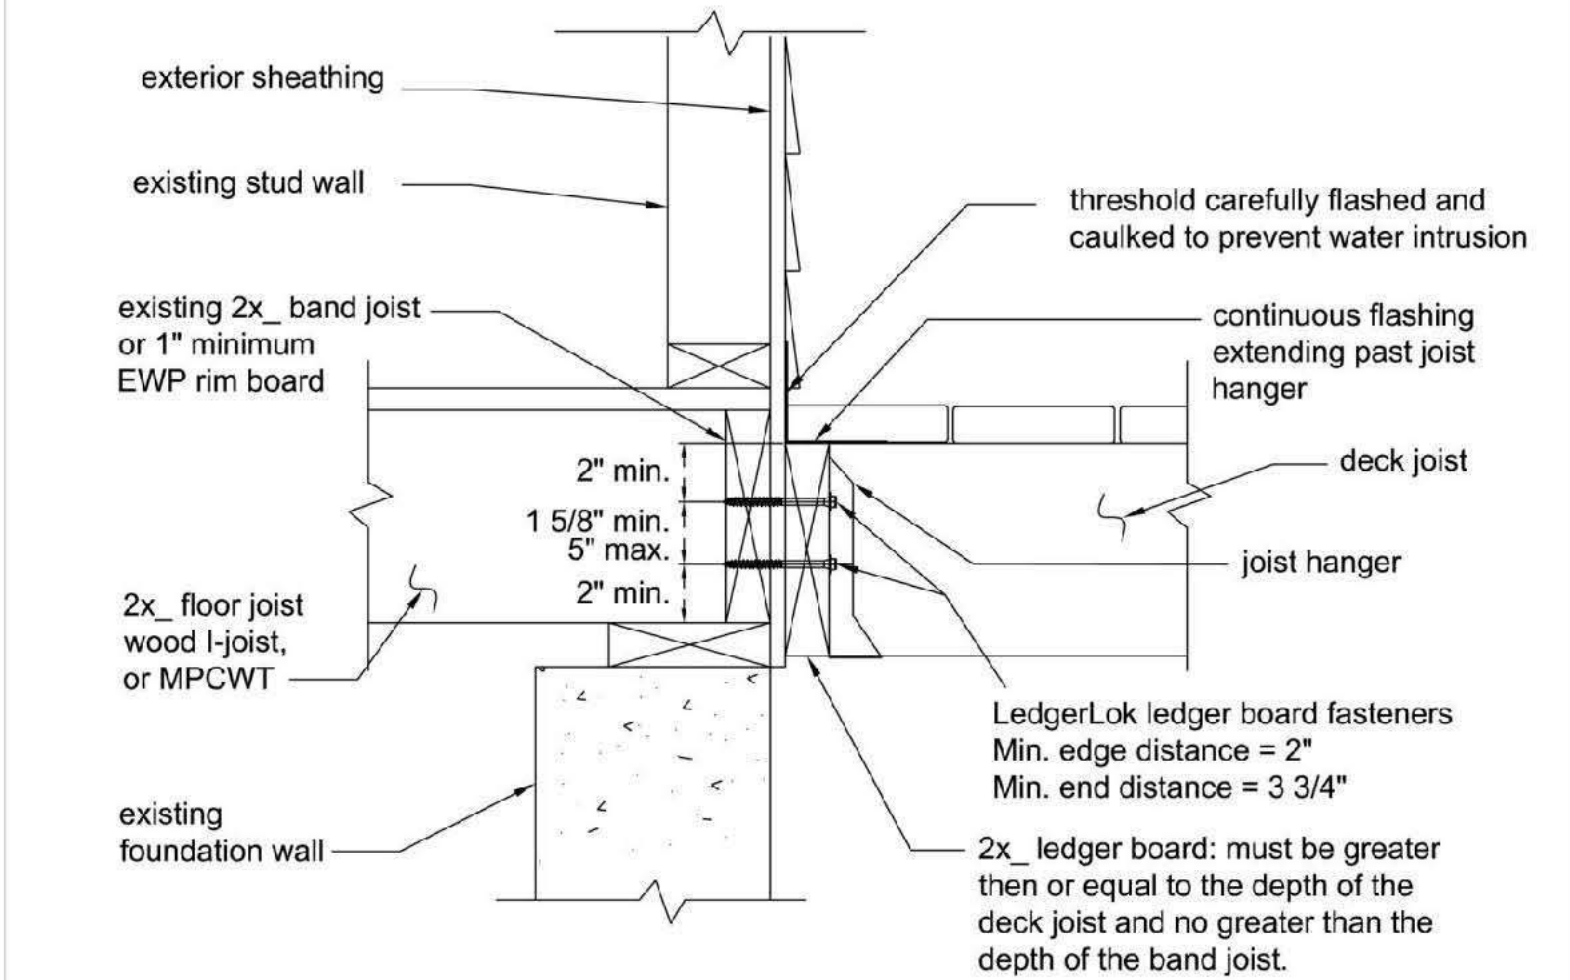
LedgerLok Ledger Board Fastener Deck Connection
